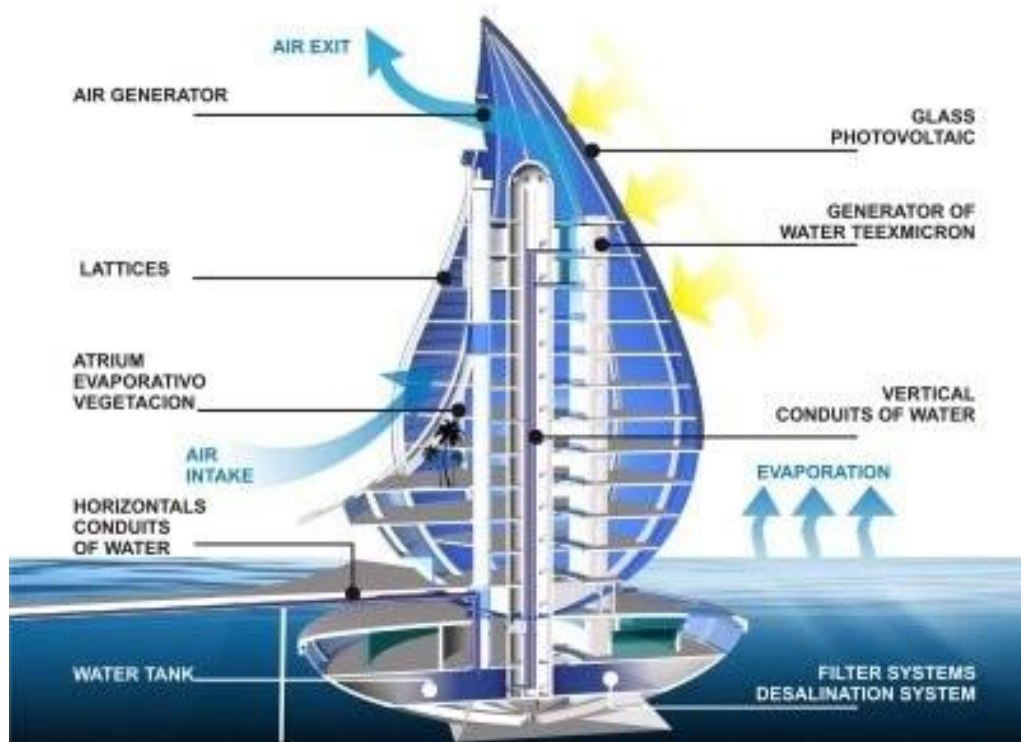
Working system of the Water Building Resort design (Garvey, 2009).
